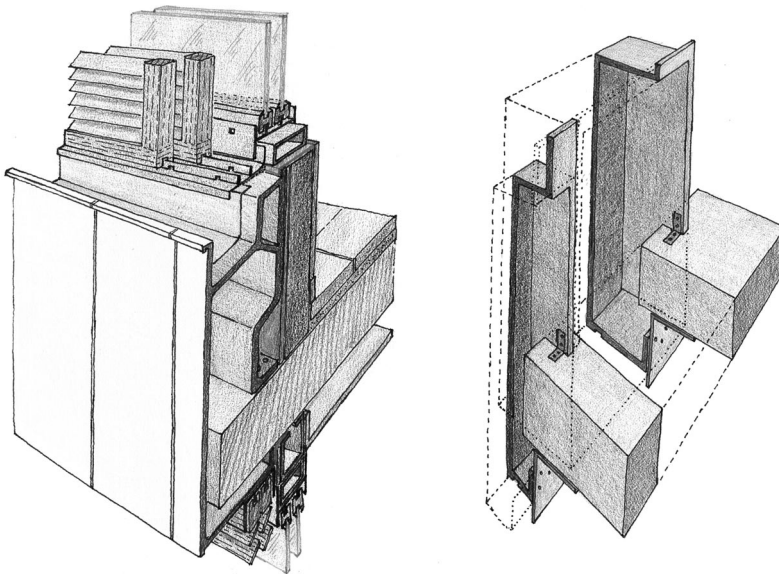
Detail from prefabricated facade elements and angular points. The anchorage of the Modular Boxes reflects an improved system compared to that of the Ciudadela building. Sorní building. Valencia. Architect, GO.DB. Architects. (Designed by: Vicente Blasco, 2016. Private Archives of Vicente Blasco.)
